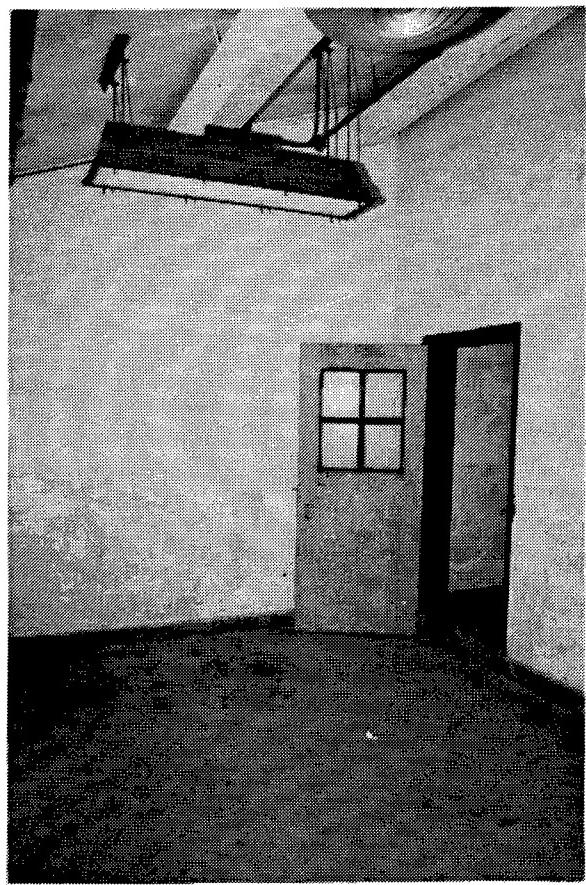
Building DT-5: Interior view of this Metal Parts Loading Building.
